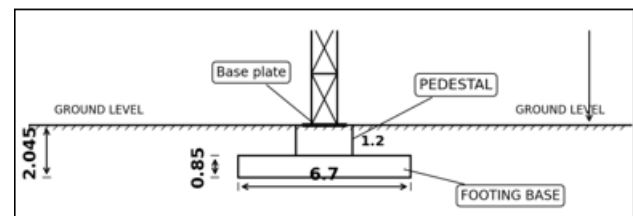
Foundation detail- base plate, pedestal and isolated footing (dimensions in metres).
